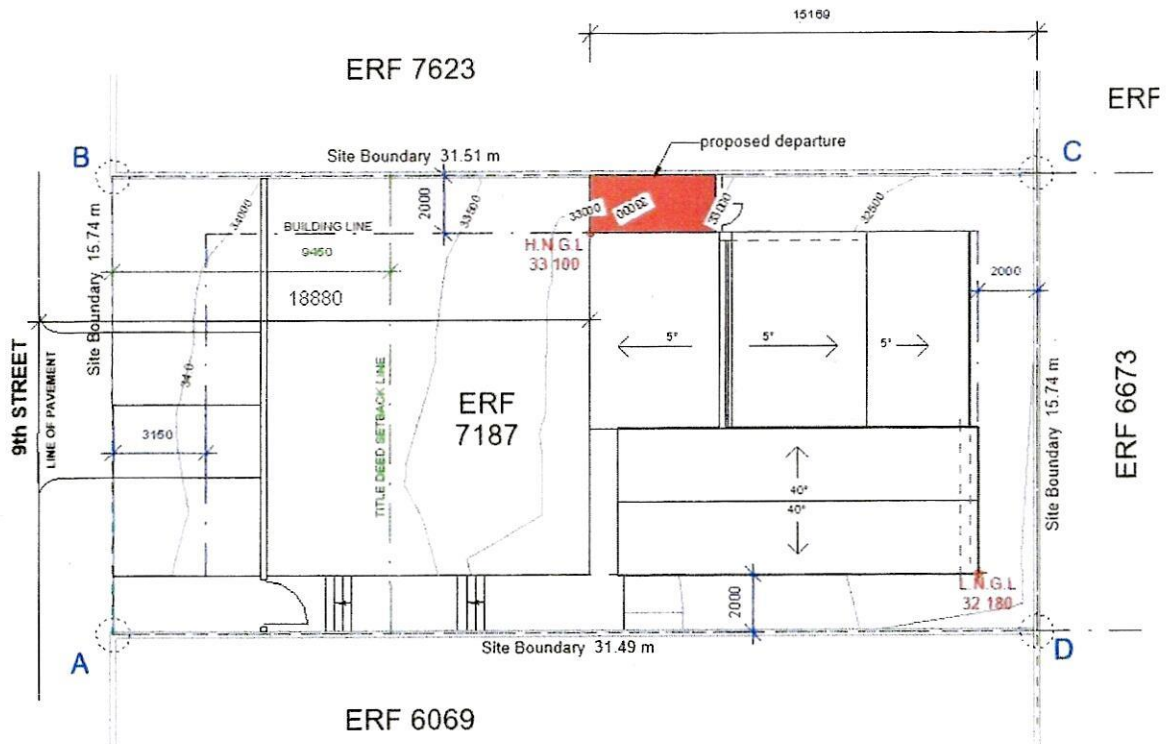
Site plan indicating position of departure in relation to 9th street.
